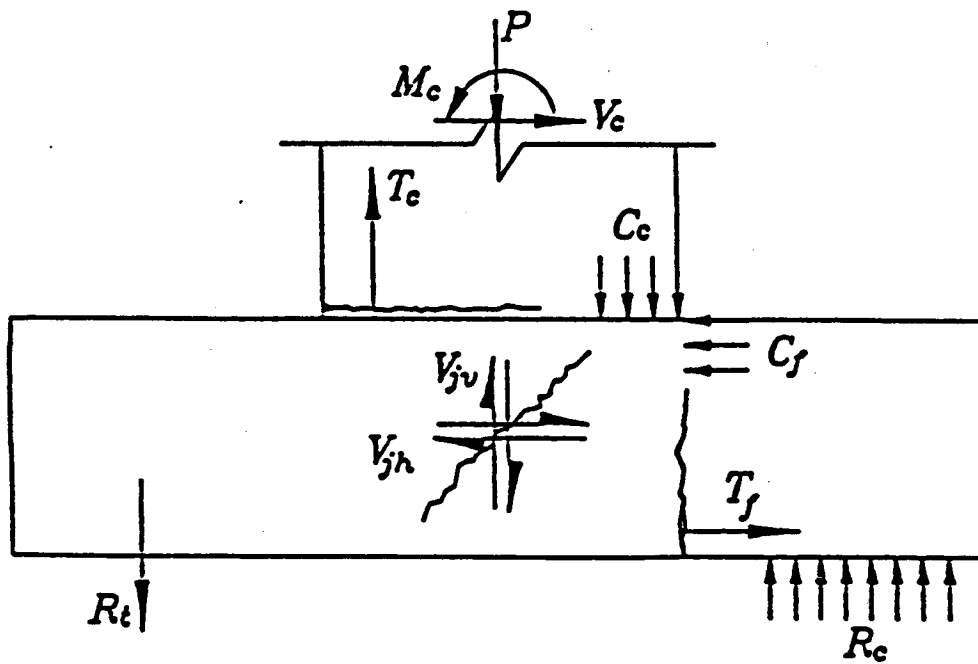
Forces in the Column/Footing Joint Region (from Xiao, et al, 1994)
